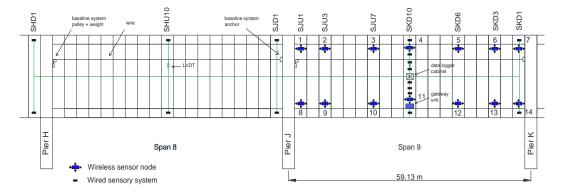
Locations of the wireless SHM system inside the concrete box of the bridge (Span 9).
